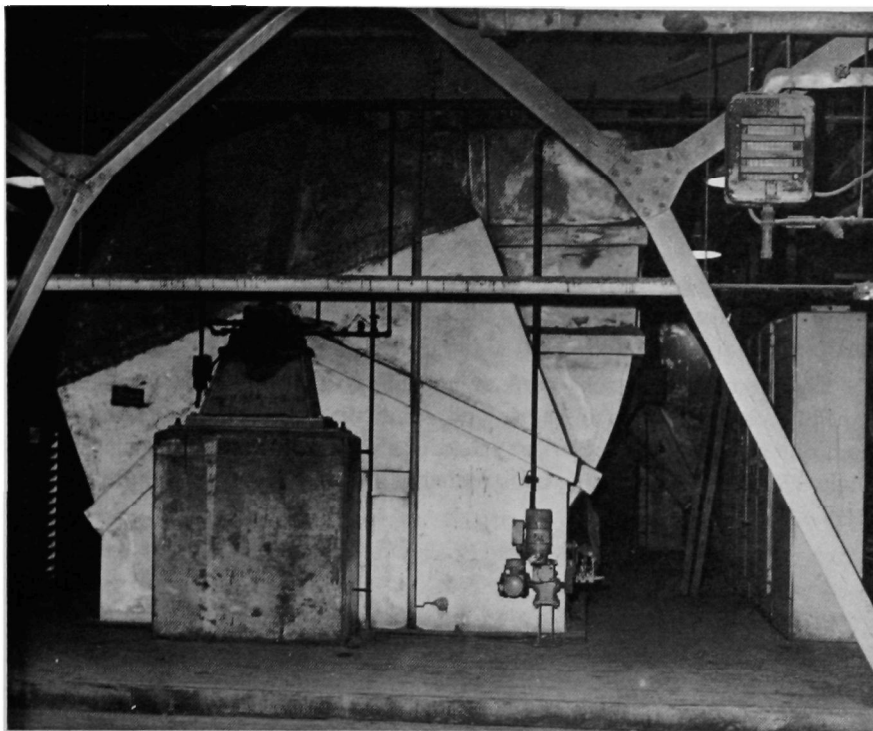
Induced-draft fan enclosure elevated platform is mounted on springs for vibrational control.
